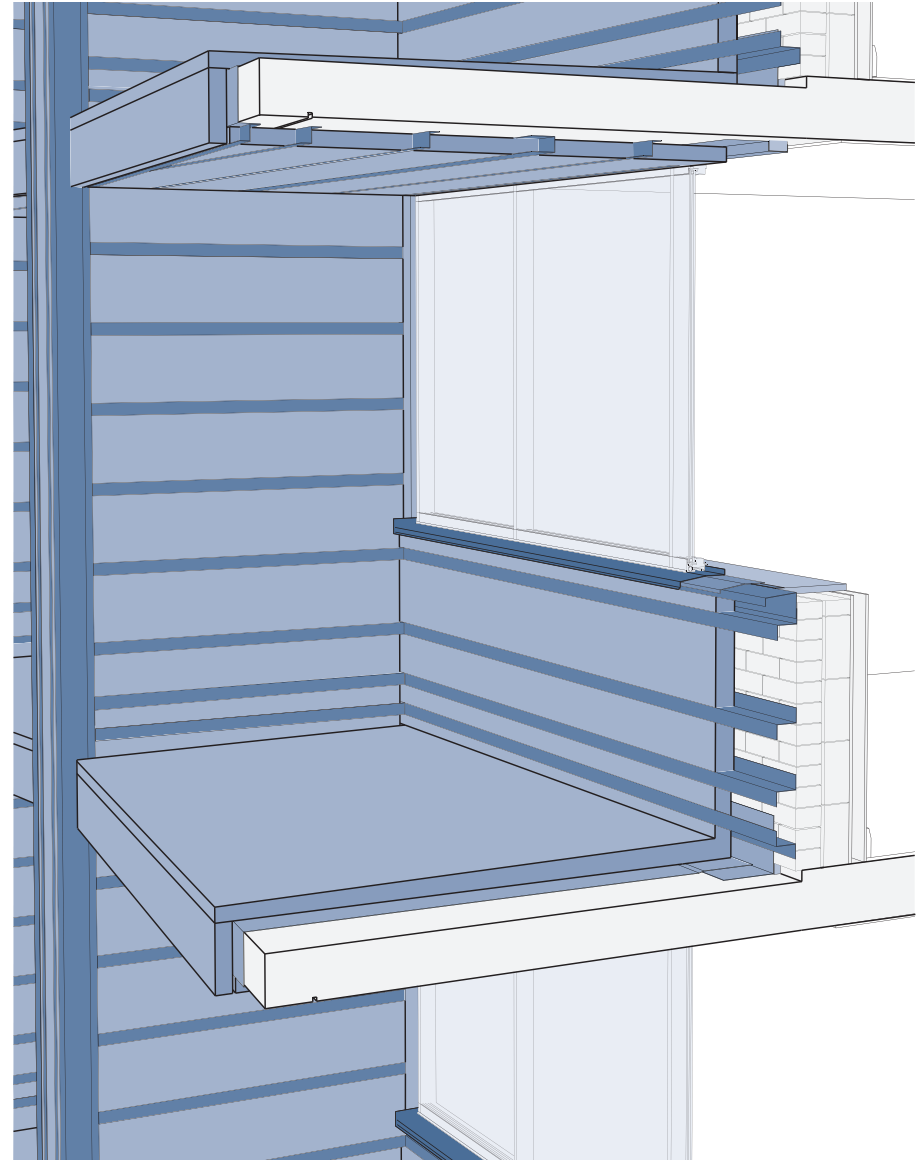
Exterior insulation is subsequently installed over the entire exposed surface areas of the balcony slab, balcony wall and shear wall. Incompressible board stock insulation has been assumed over the top and edge of the balcony slab. The remaining areas have spray polyurethane foam insulation applied continuously.
